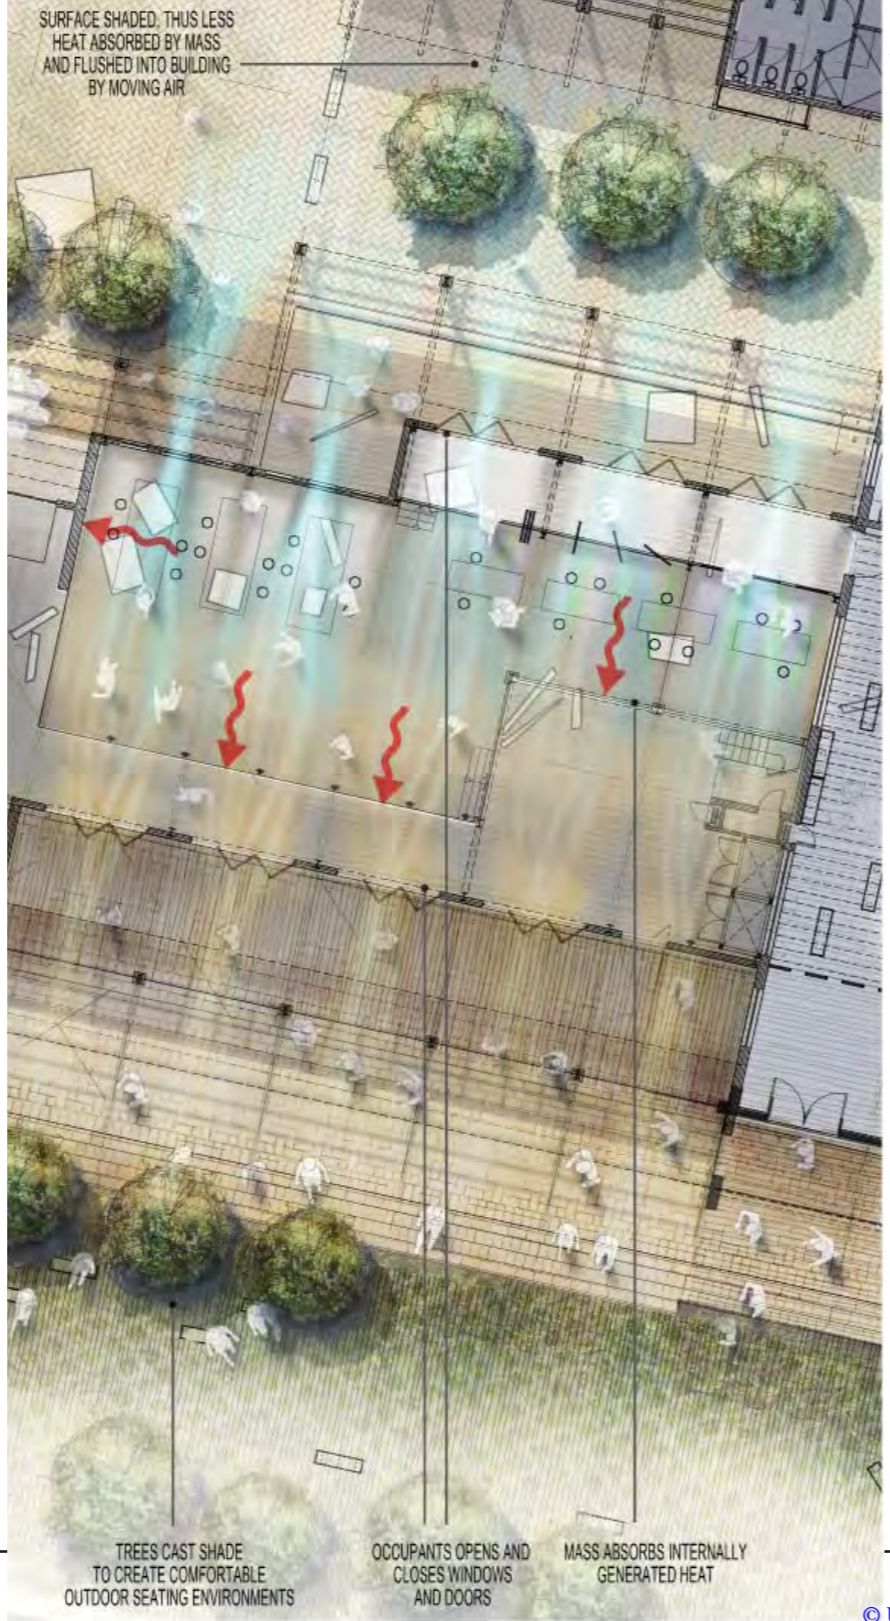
b the resulting building behaviour on plan during the over heated period (Author, 2014)
